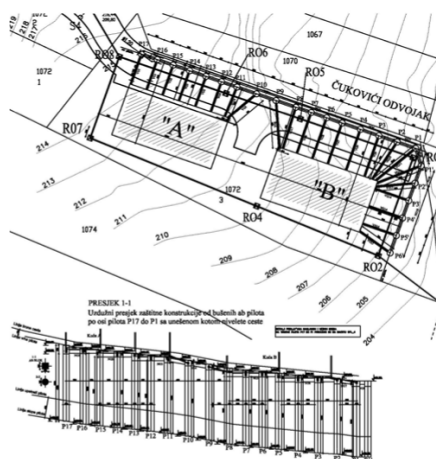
Plan view and cross section of the anchored pile reinforced-concrete structure as used during construction of urban villas in the Sljeme foothills zone in Zagreb
